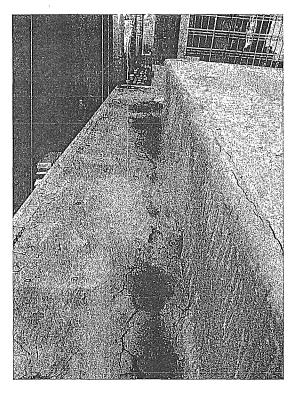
Detail view of parapet and top of cornice. Through-wall scuppers at the northern and eastern parapet walls drain the cornice back to the roof (photograph taken on 02/27/2018).
